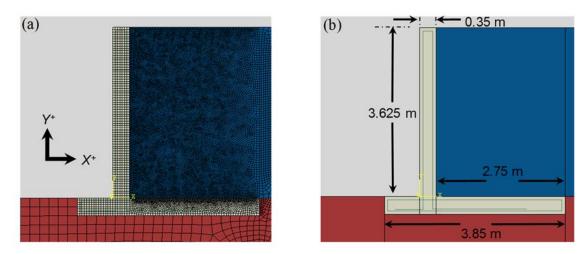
FE mesh of concrete retaining wall and backfill soil (left side), dimension details of retainining wall (right side).
